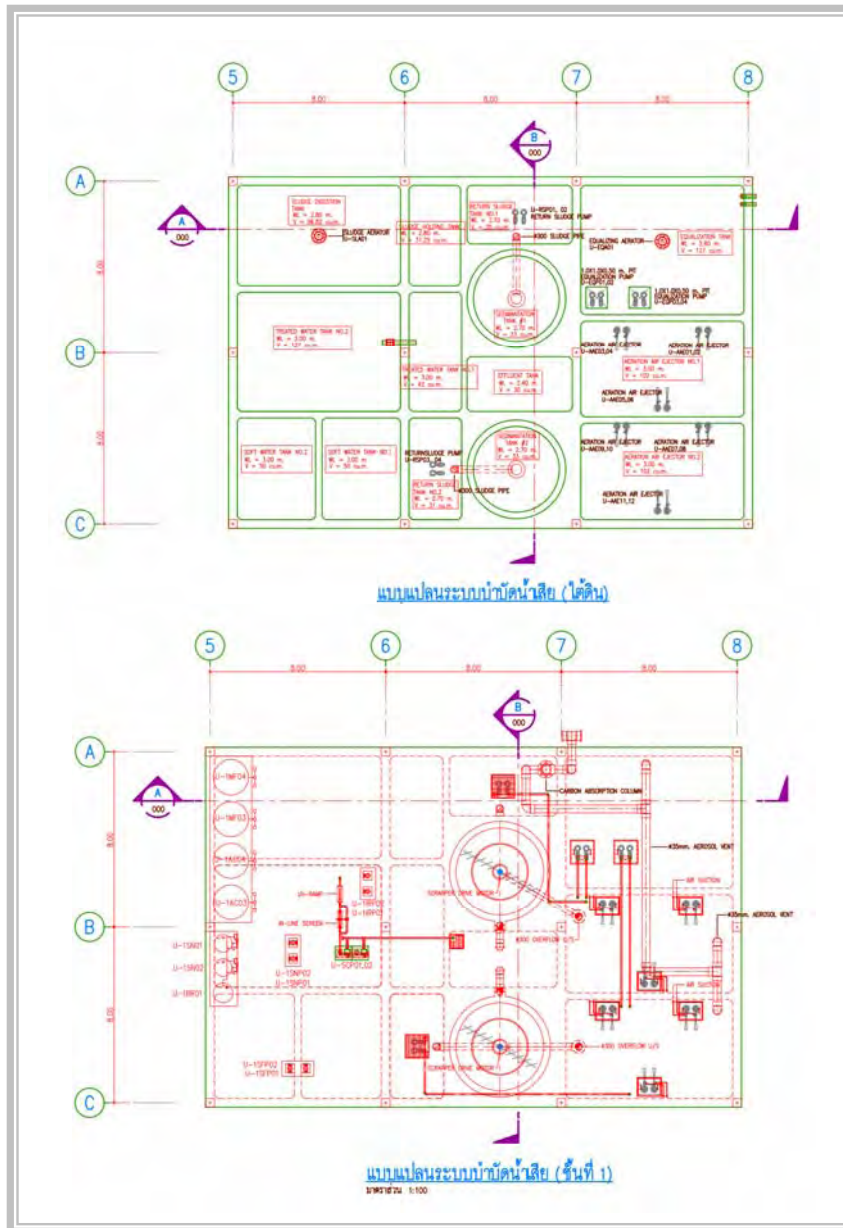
Recycle Water Treatment Plant Layout
